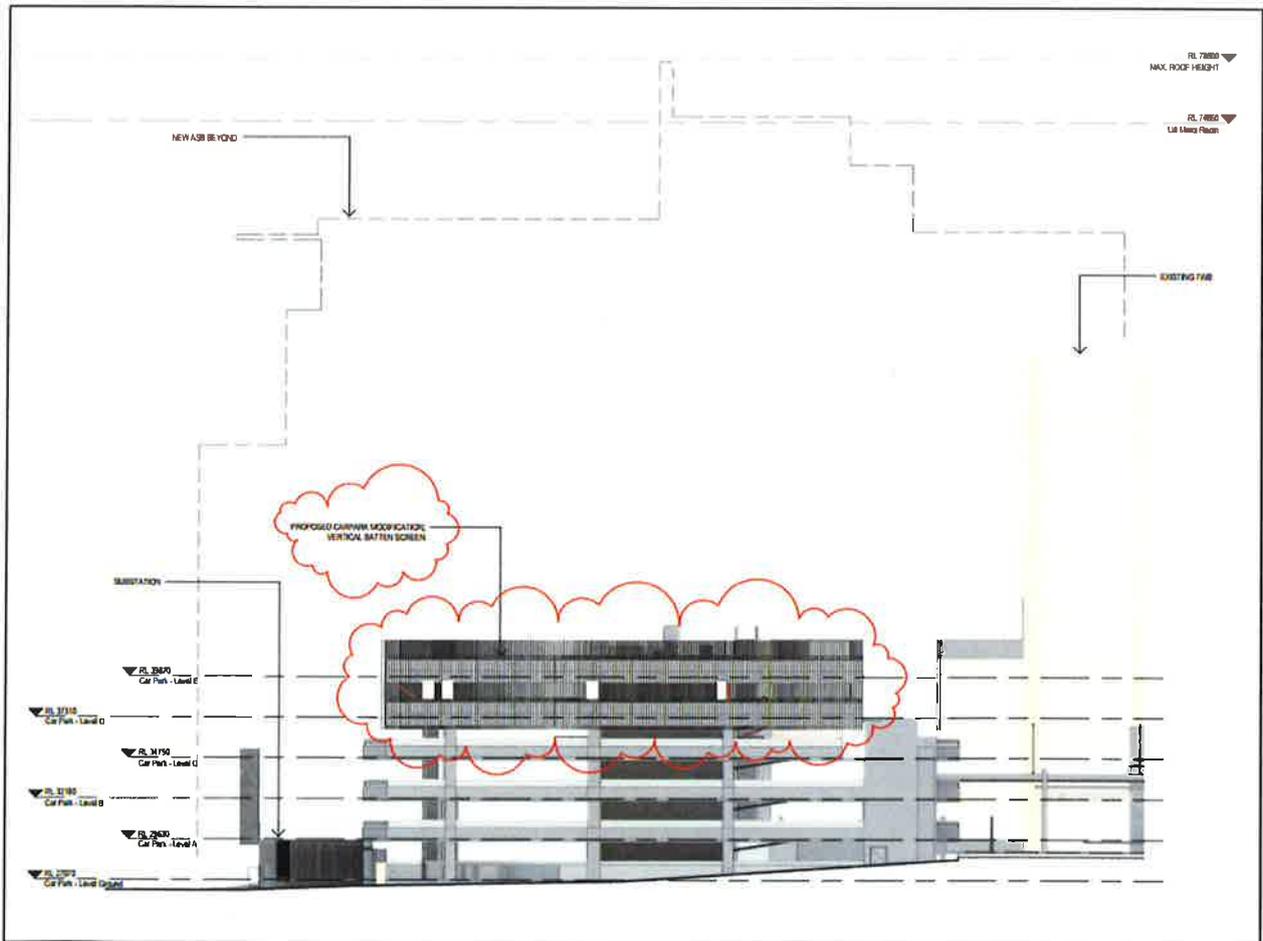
South Elevation – Gray Street Car Park (source: Applicant's Modification Report)
